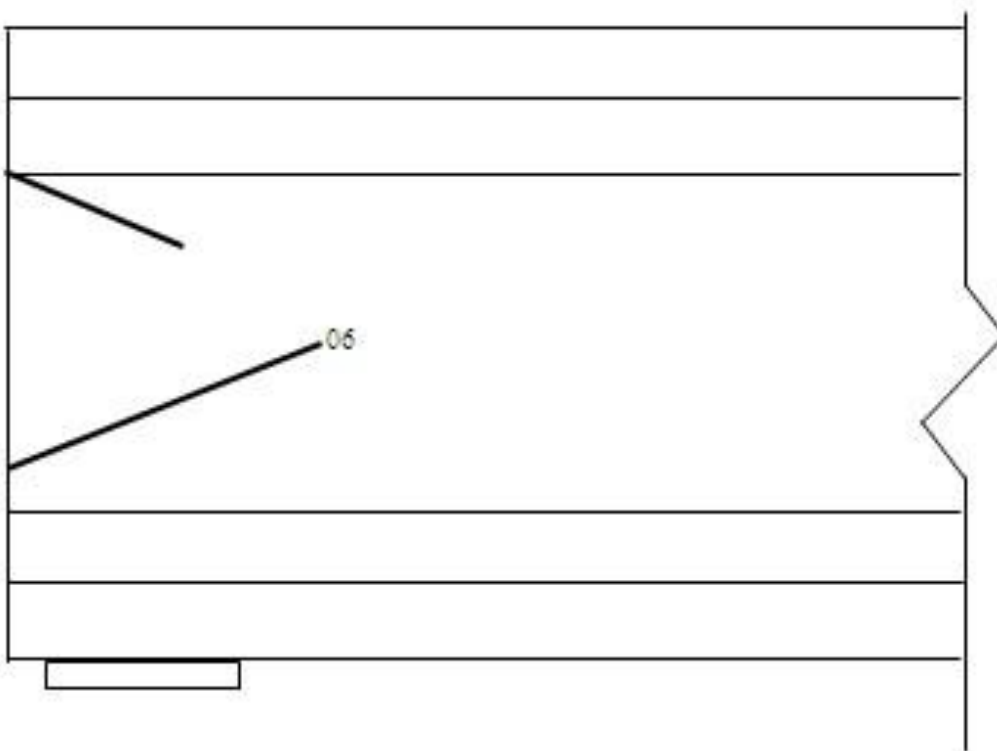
Crack diagram for exterior girder on east side, west face, north abutment (#1829).
